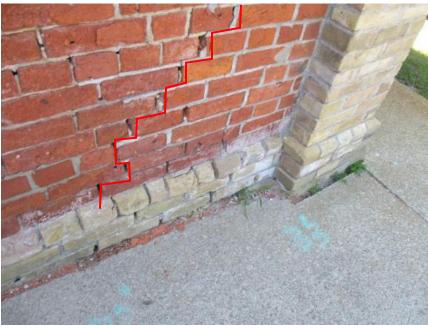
View of step crack continuing through masonry brick at east elevation and mortar deterioration.
